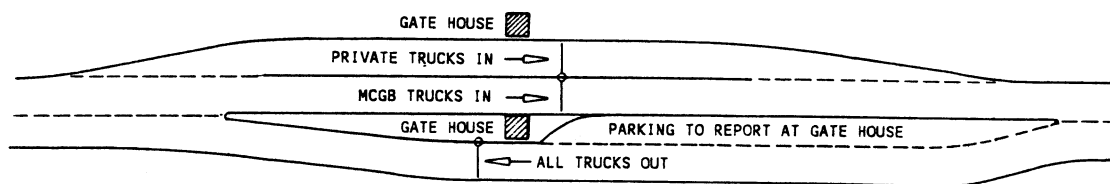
Proposed modification of entrance arrangements at Deonar disposal site
